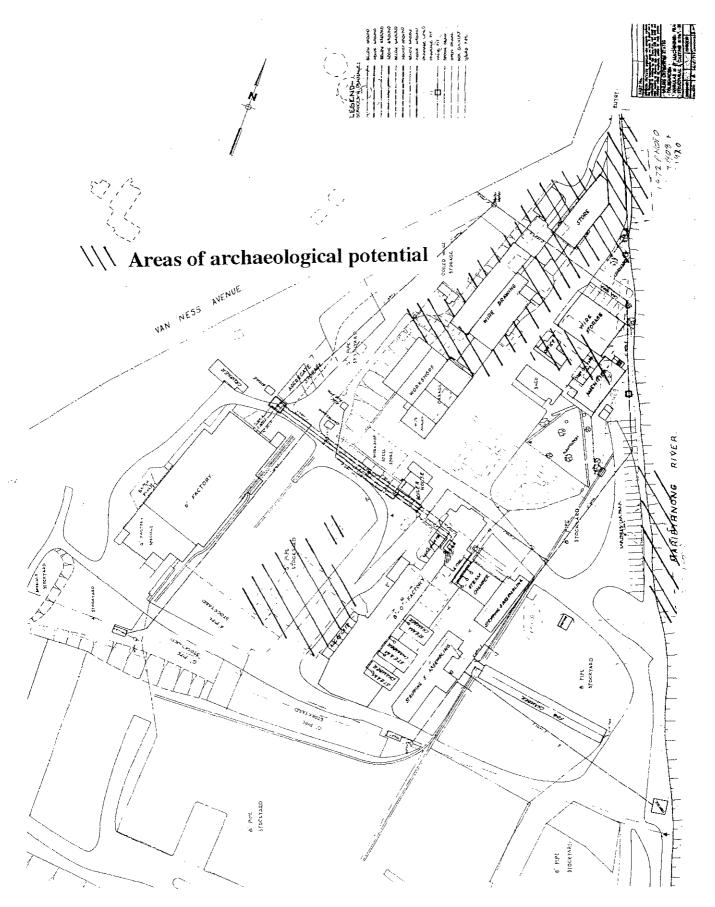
Location plan of areas of archaeological potential (demolished buildings and structures)
